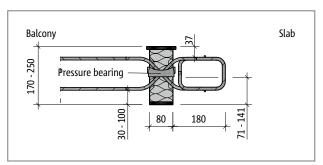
Schöck Isokorb® T type Q-E-W-VV5: Product section
